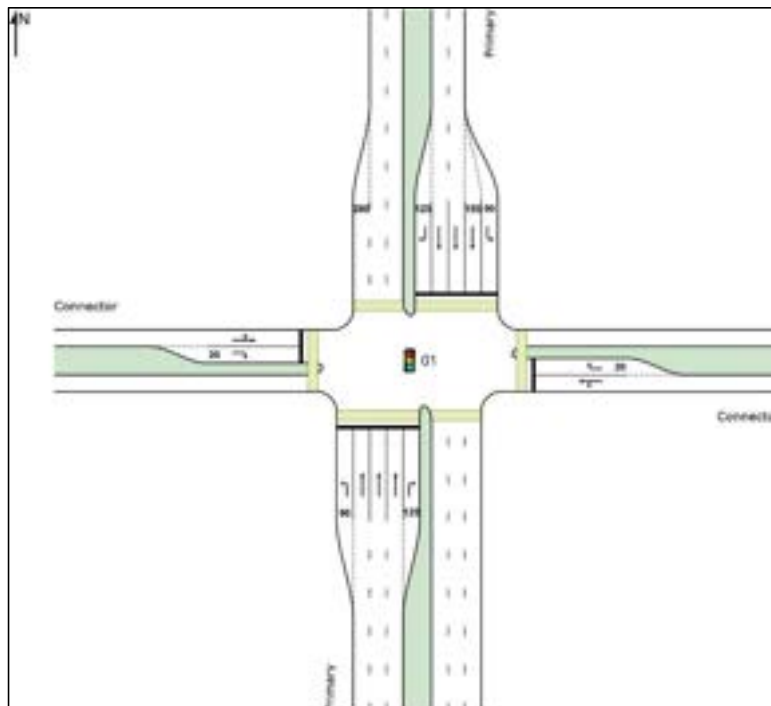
VPA standard benchmark layout - primary arterial – connector street intersection
